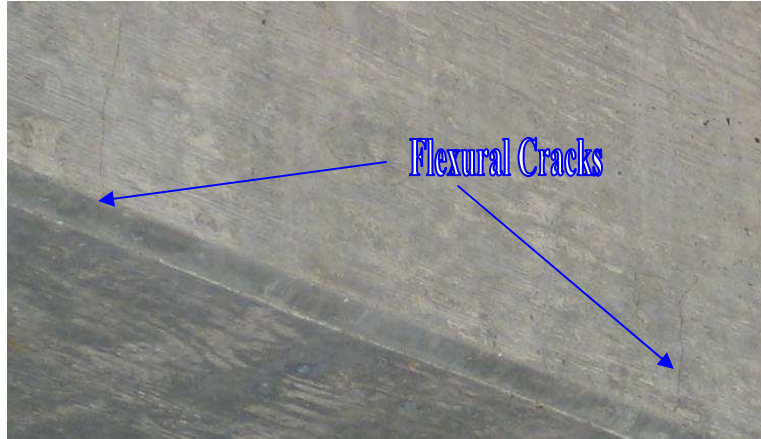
Flexural Cracks in Girders Found After Cleaning Surface
